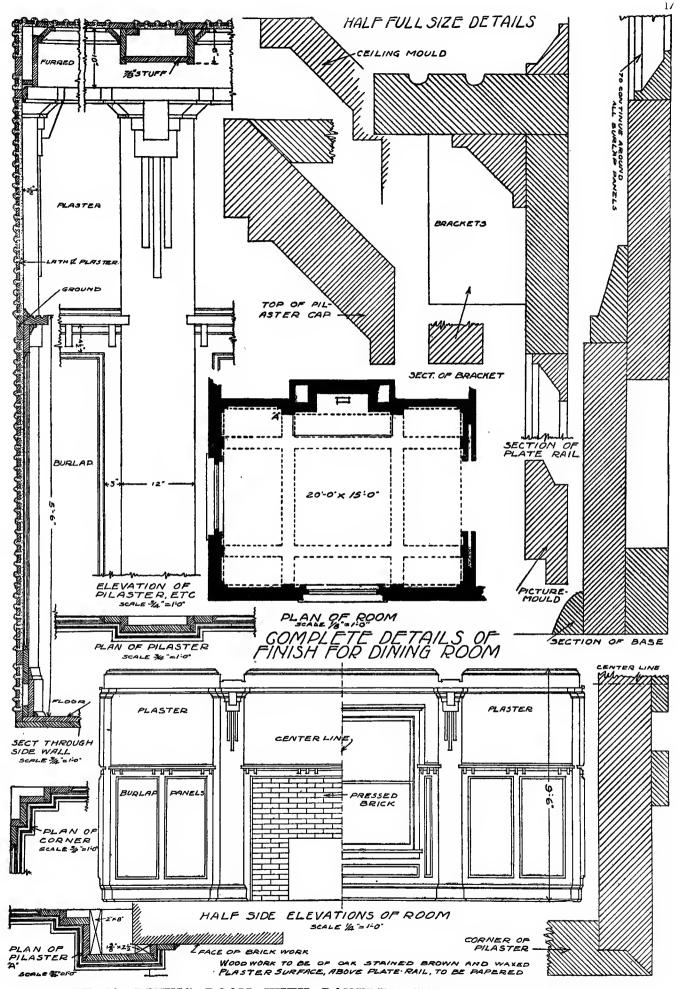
DINING ROOM WITH PANELED CEILING AND SIDEWALLS
